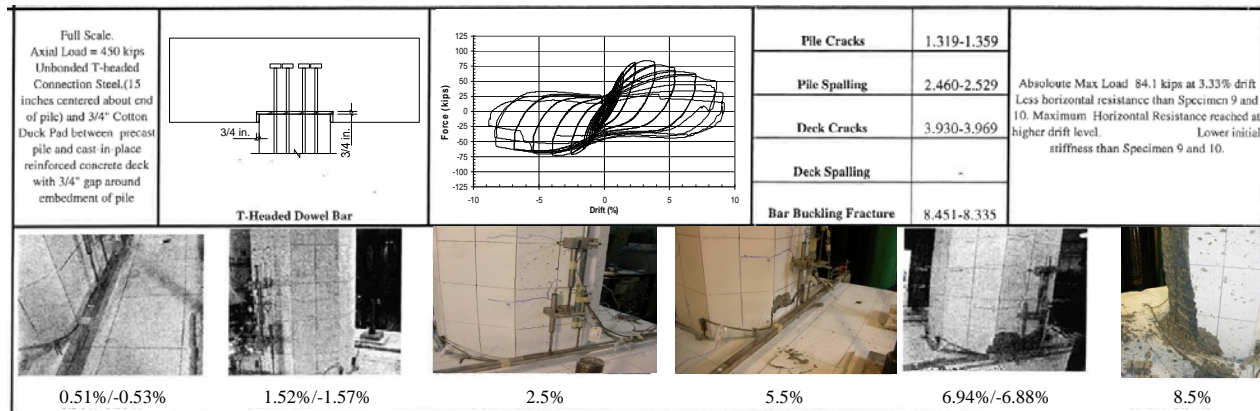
Flexible Pile Connection Test Results (Photo by Charles Roeder, Univ. of Washington)
